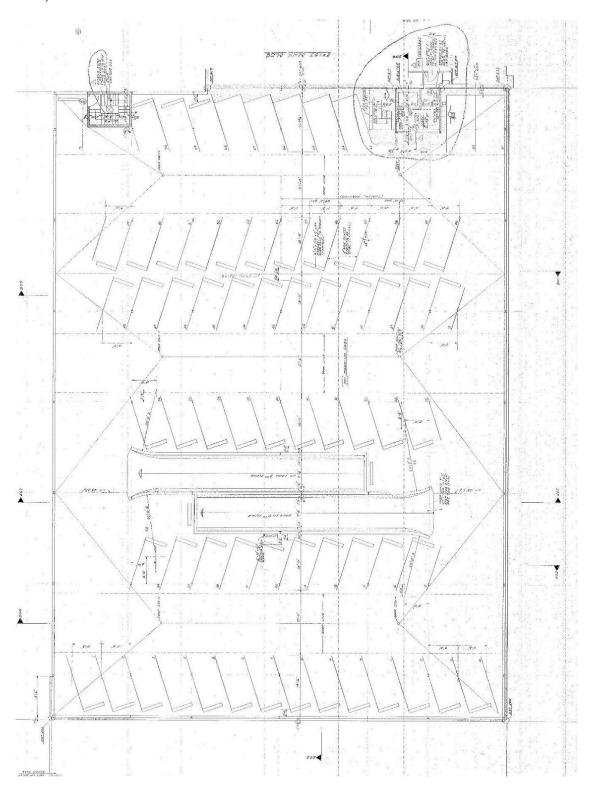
First Wichita National Bank Parking Garage/Motor Bank Third Floor Plan (Wood and Sibeck, Architects 1965).
